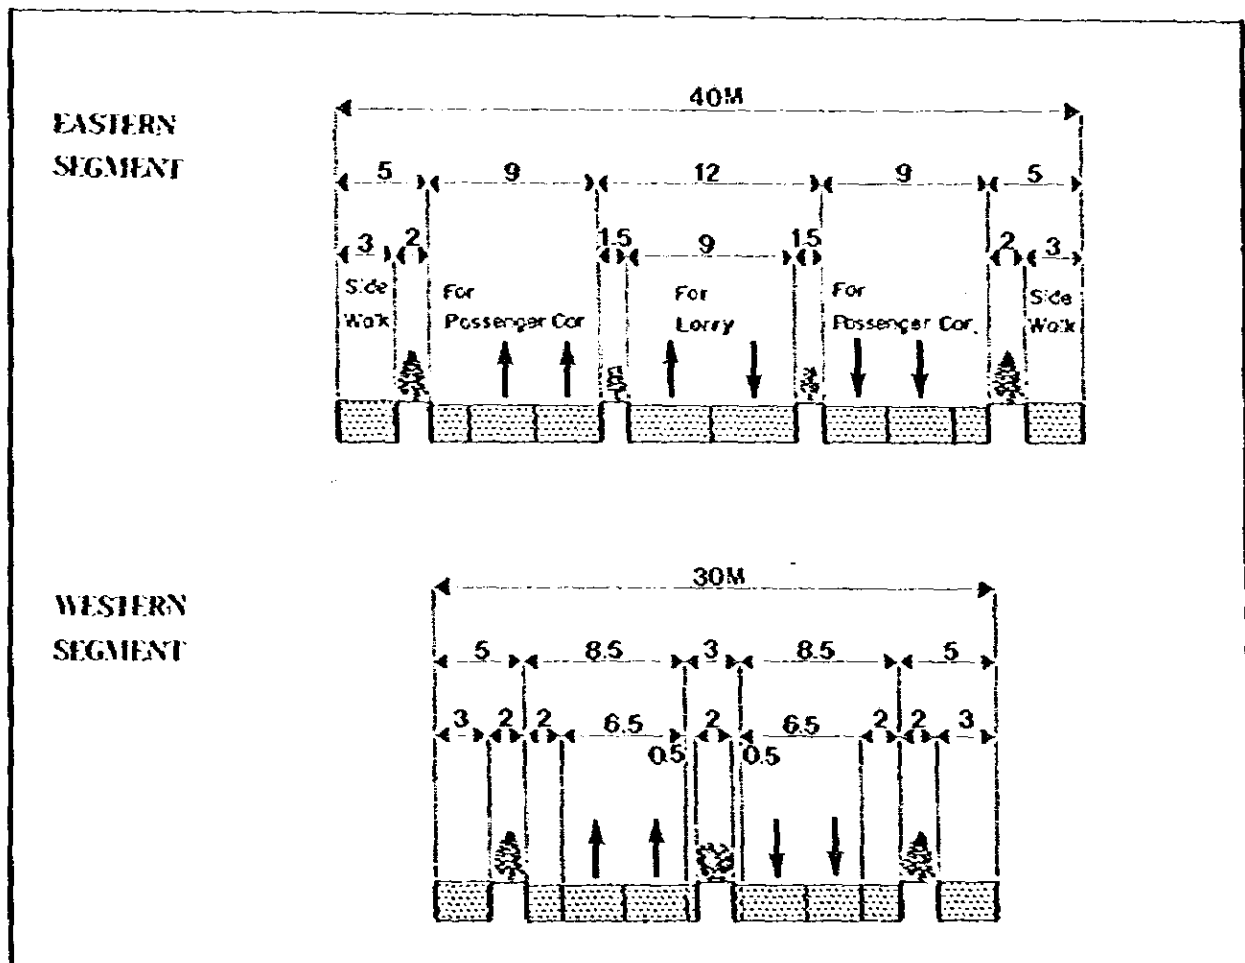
TYPICAL CROSS SECTION (ULTIMATE PLAN) OF THE INNER RING ROAD
